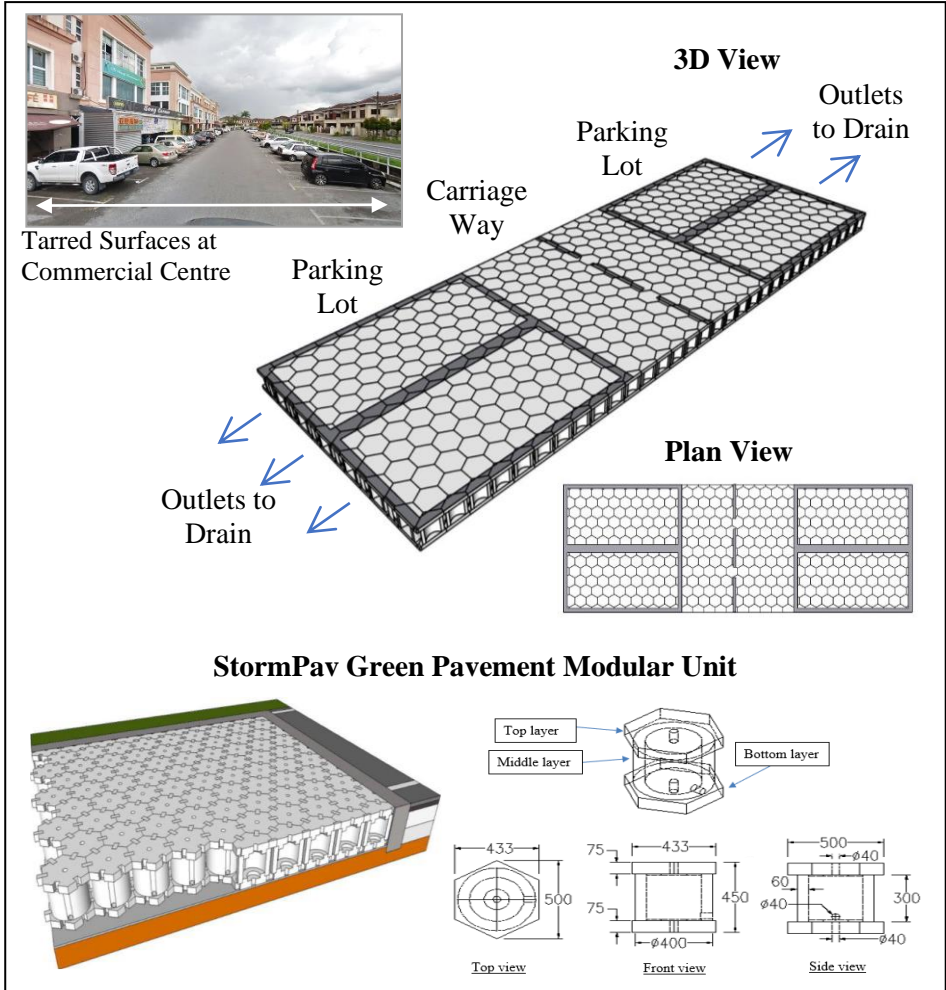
Application of StormPav Green Pavement as a permeable road in a commercial center
